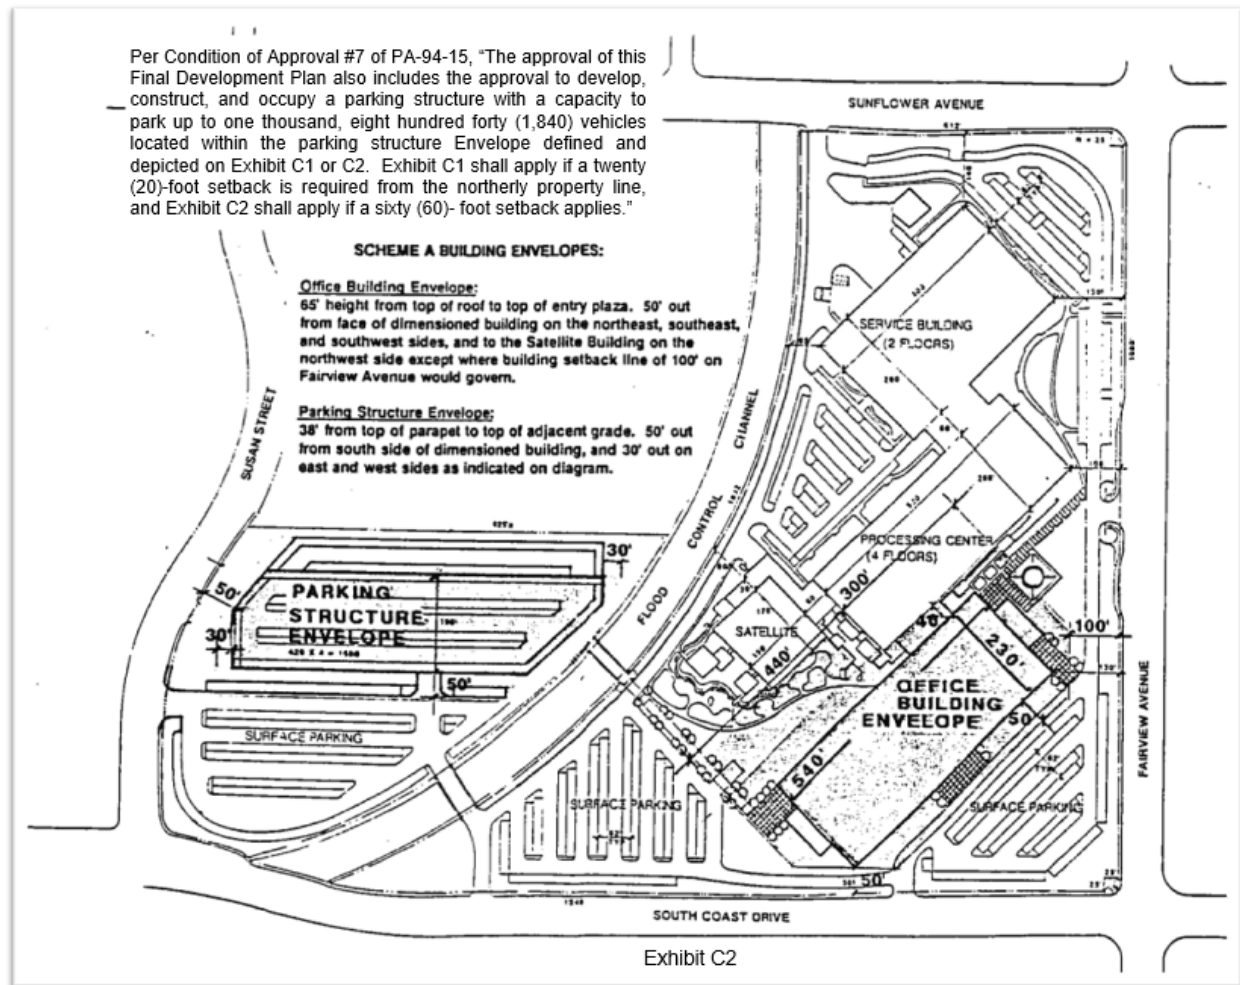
Illustration of the 60-Foot North Parking Structure Setback
